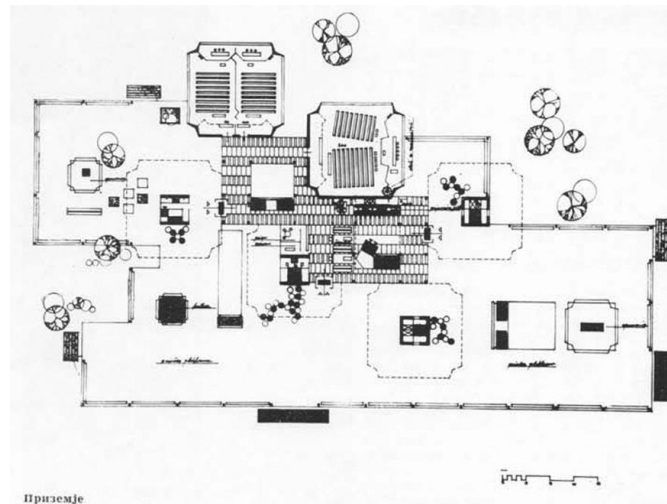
Schematic floor plan of the former Central Committee building in Skopje, original drawing by the author Petar Mulichkovski.
